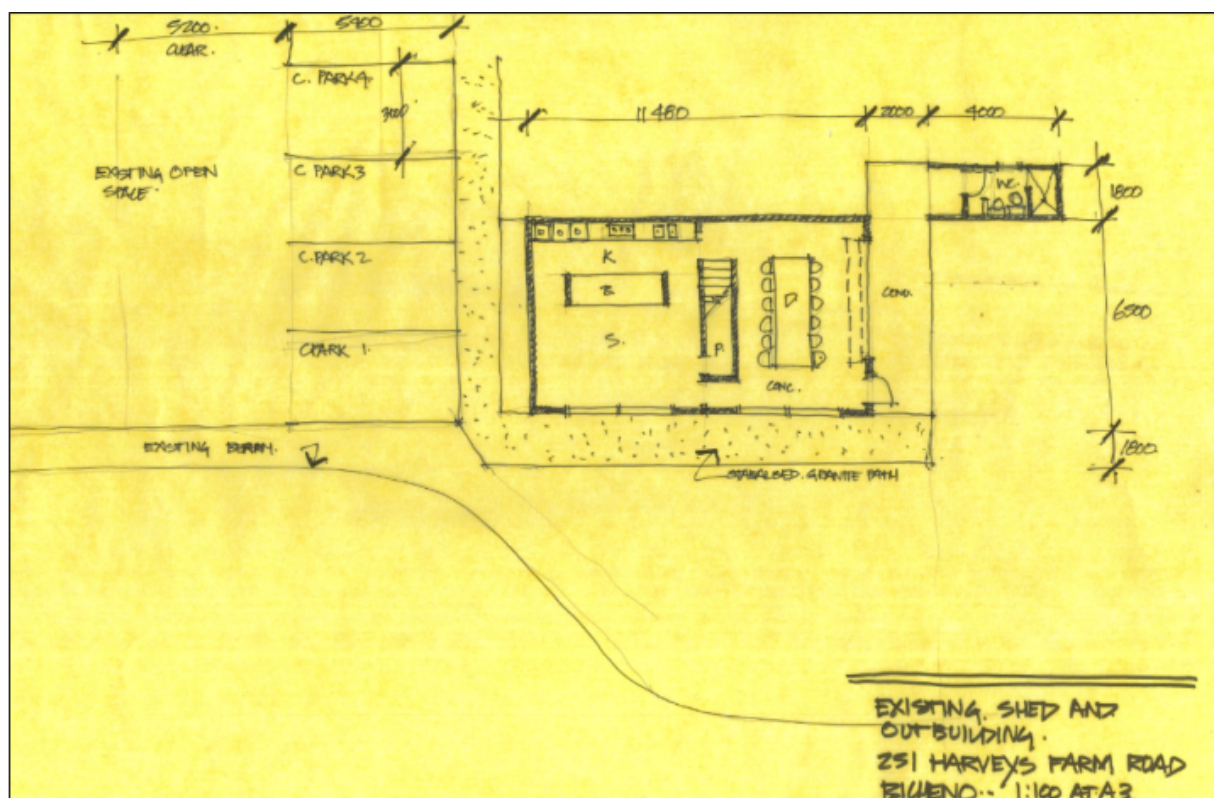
Floor Plan of outbuildings for proposed Change of Use
